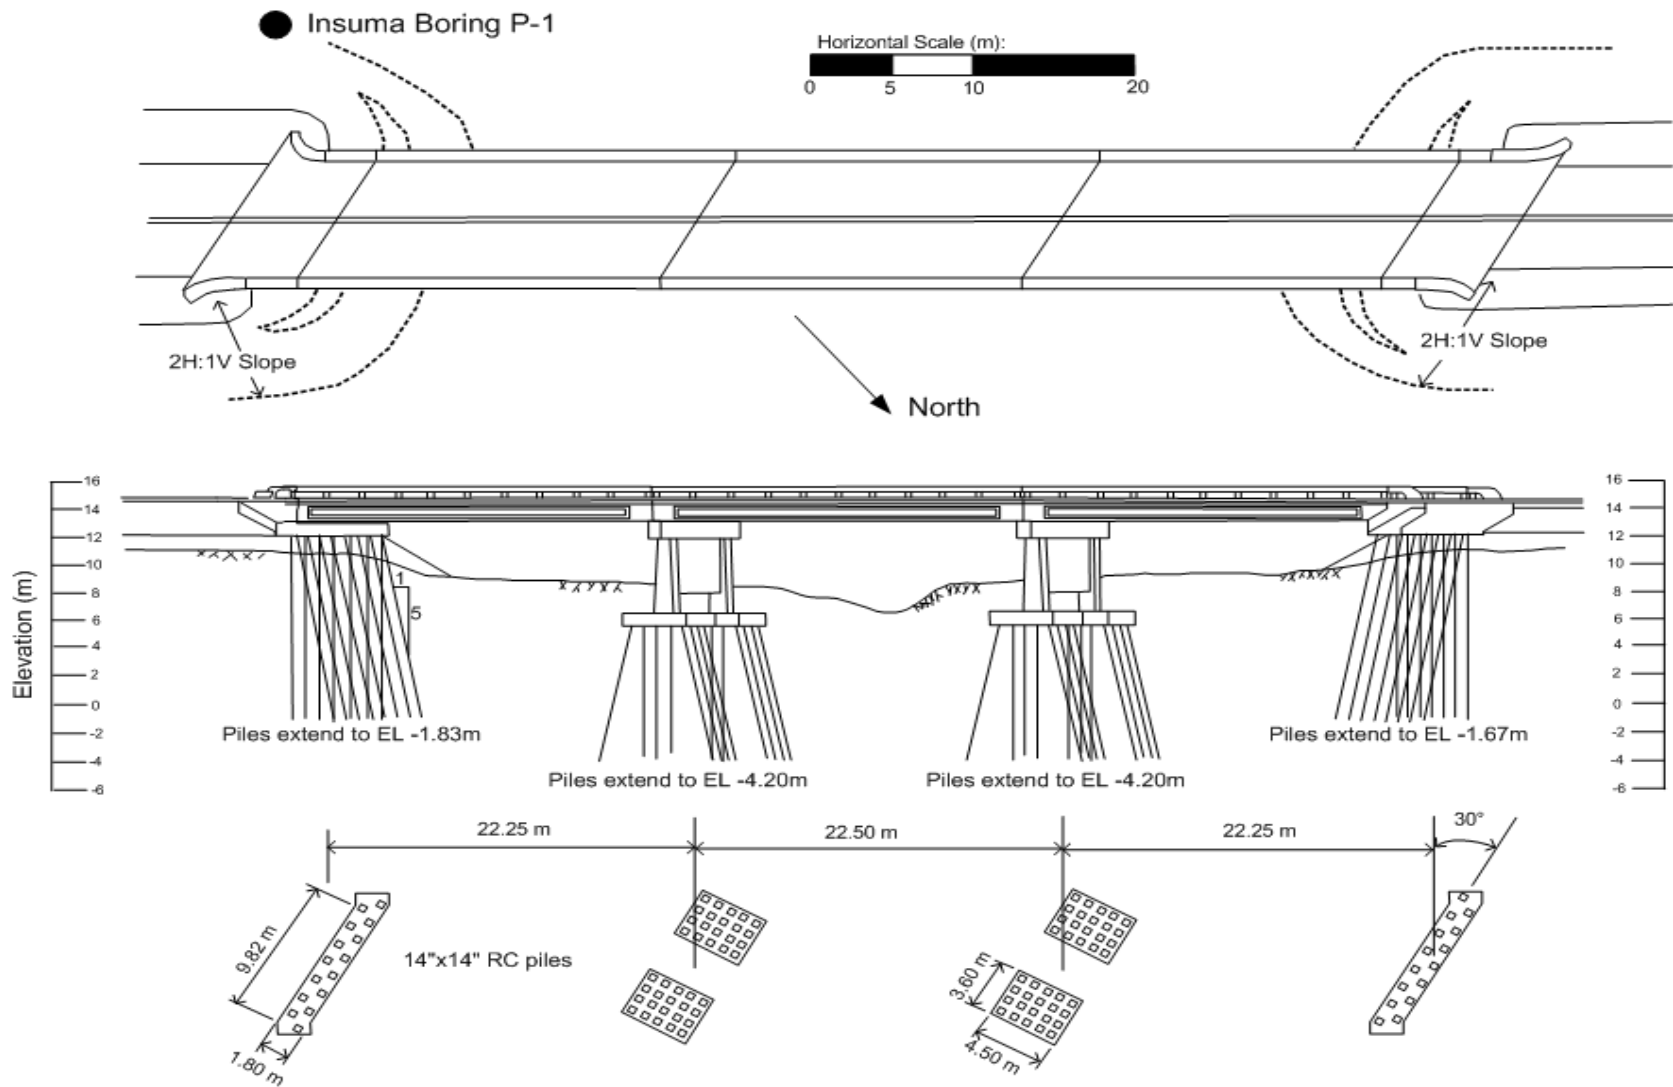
Simplified Sketch of the Plan and Profile Views of the Rio Cuba Bridge as Shown on the Bridge Plans Provided by the Costa Rican Ministry of Transportation
